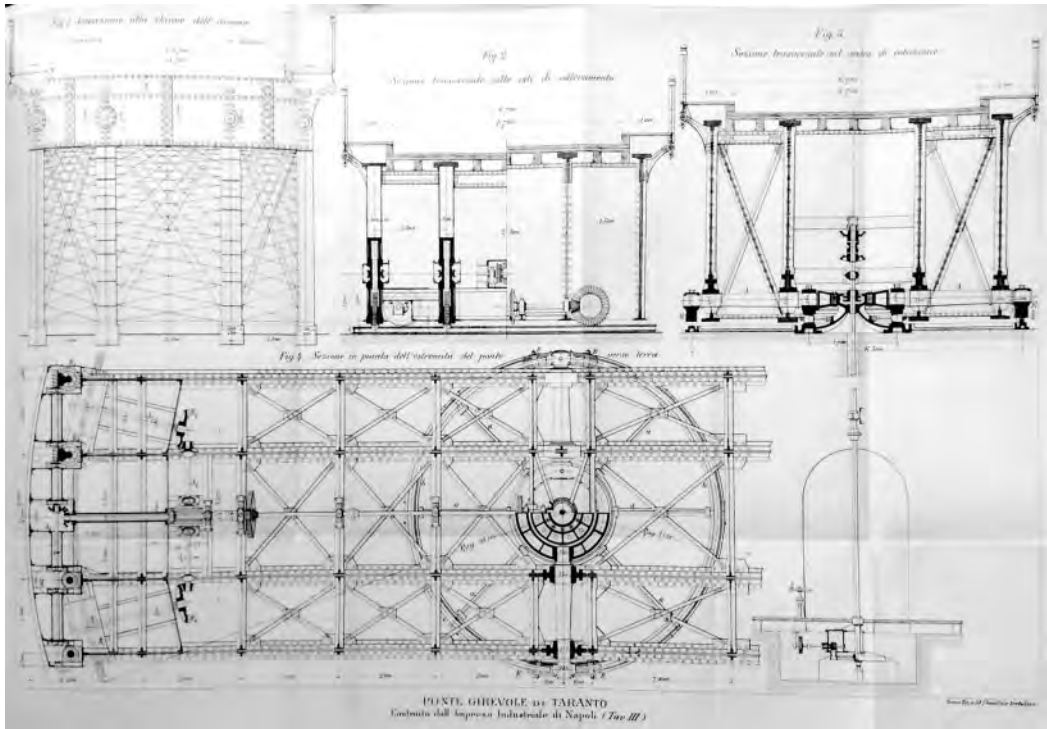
Construction details of the swing bridge of Taranto and sections of the turning mechanism (Crugnola 1888).
